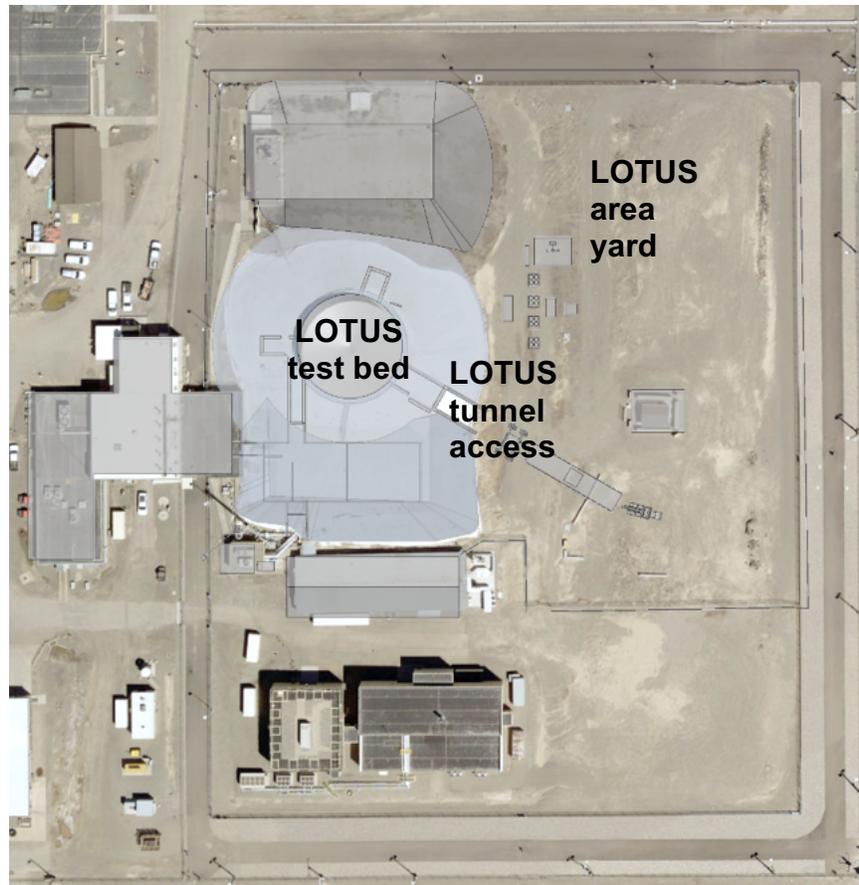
Aerial View of the ZPPR Area Overlaid With the Conceptual LOTUS Facility Layout Showing the Cell, Proposed Tunnel Access, Support Areas, and Yard Area.
